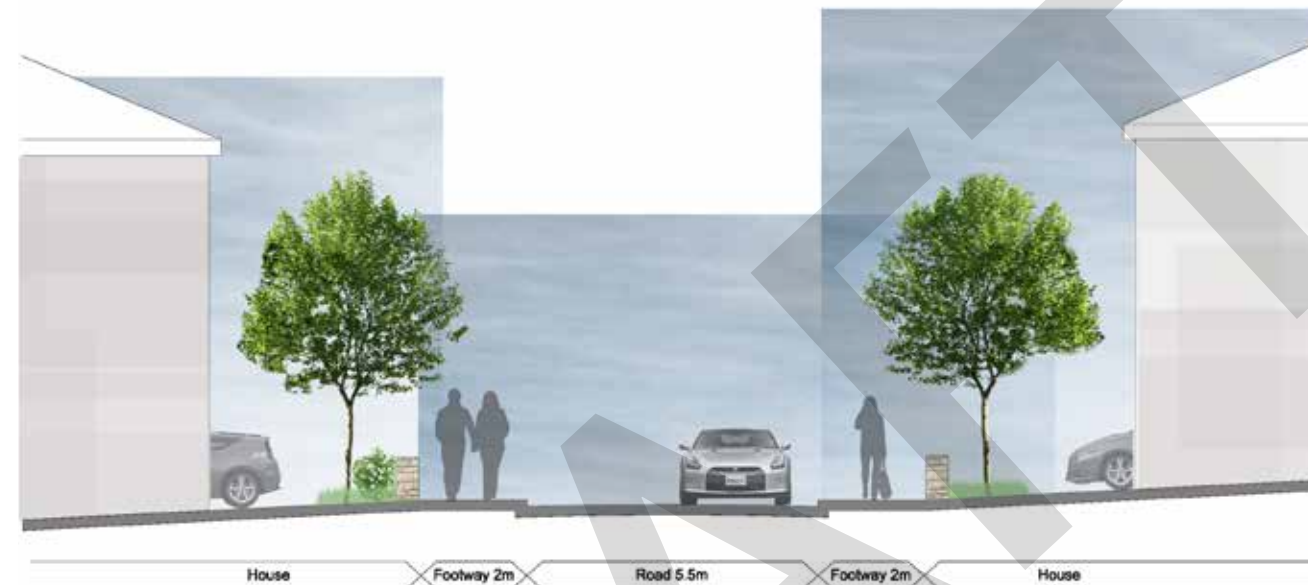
PRIMARY STREET TYPICAL SECTION 1: AVENUE
